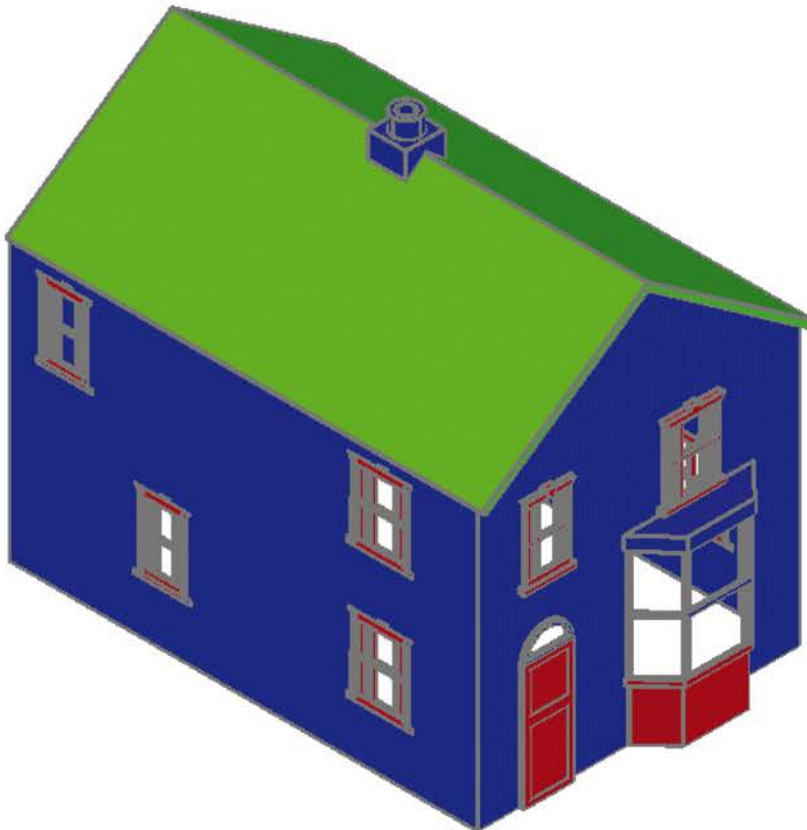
First example – a Realistic view of the assembled walls, windows, bay, roof and chimney
